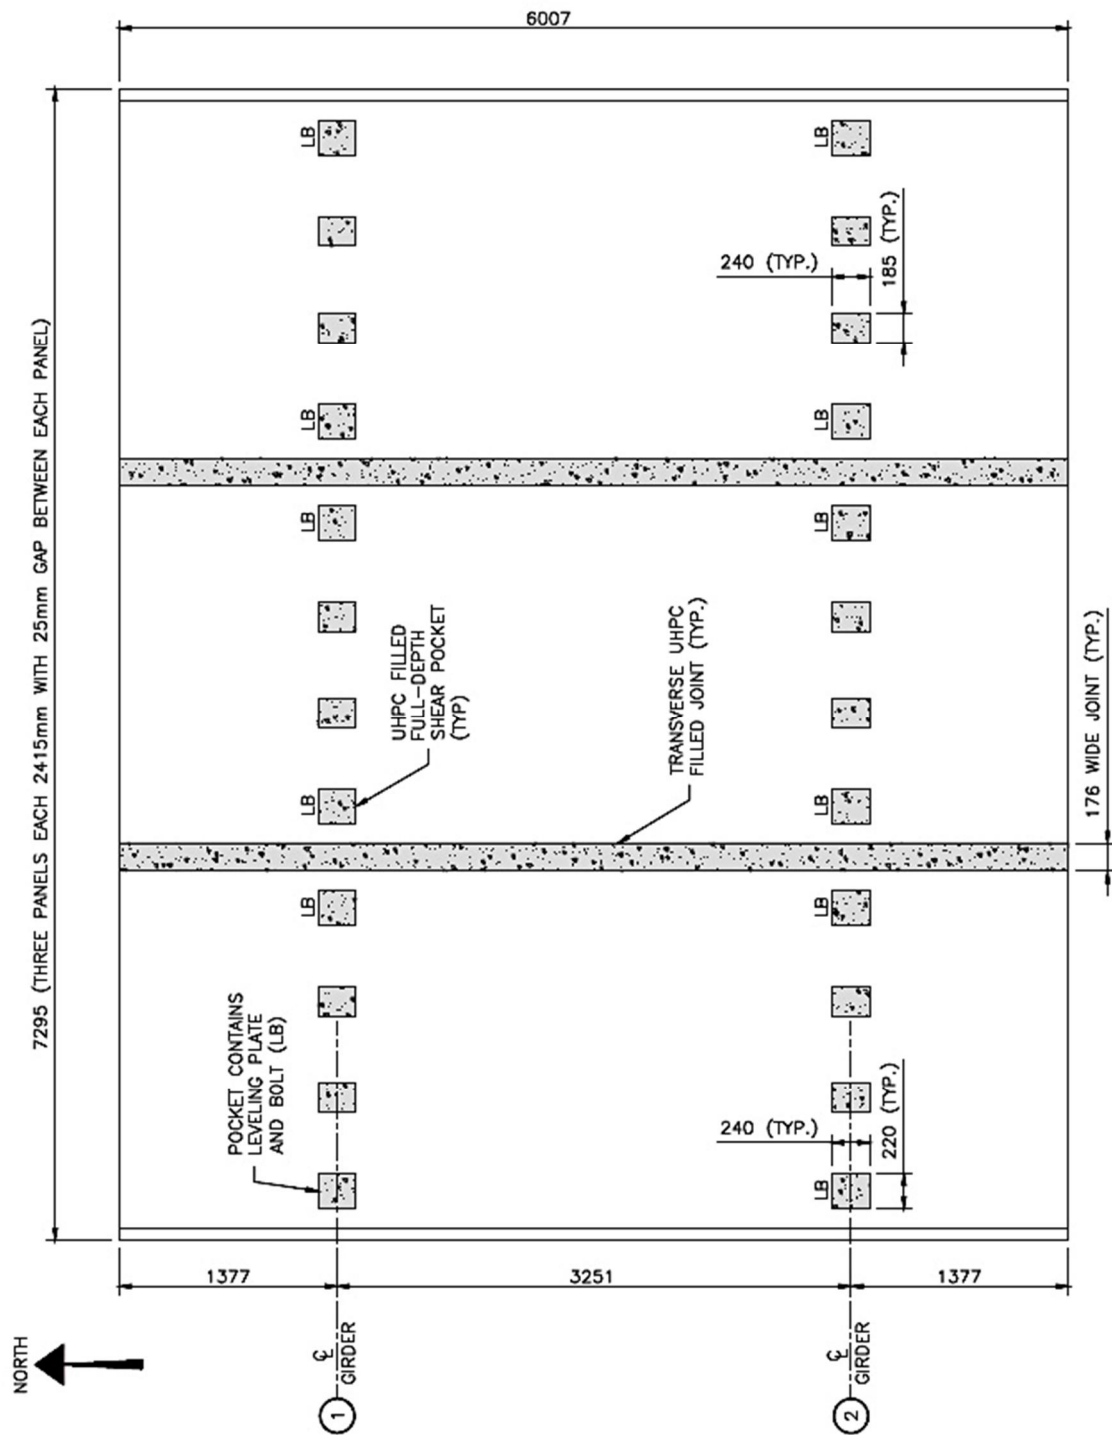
Typical PPCP Dimensions and Details (Plan View)
